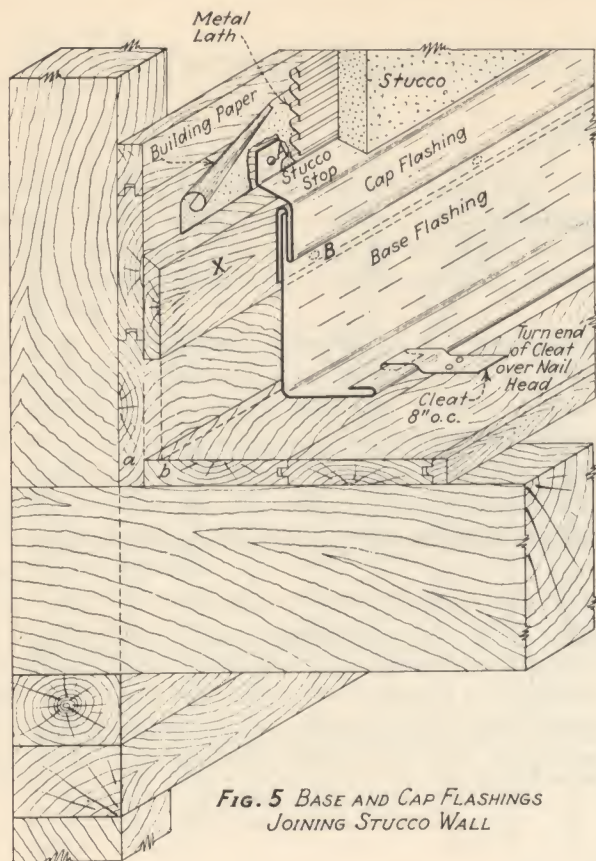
BASE AND CAP FLASHINGS JOINING STUCCO WALL
